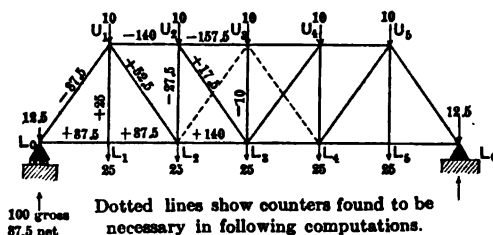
Dead Panel Loads and Index Stresses. Single-Track Through Pratt Truss Railroad Bridge.
